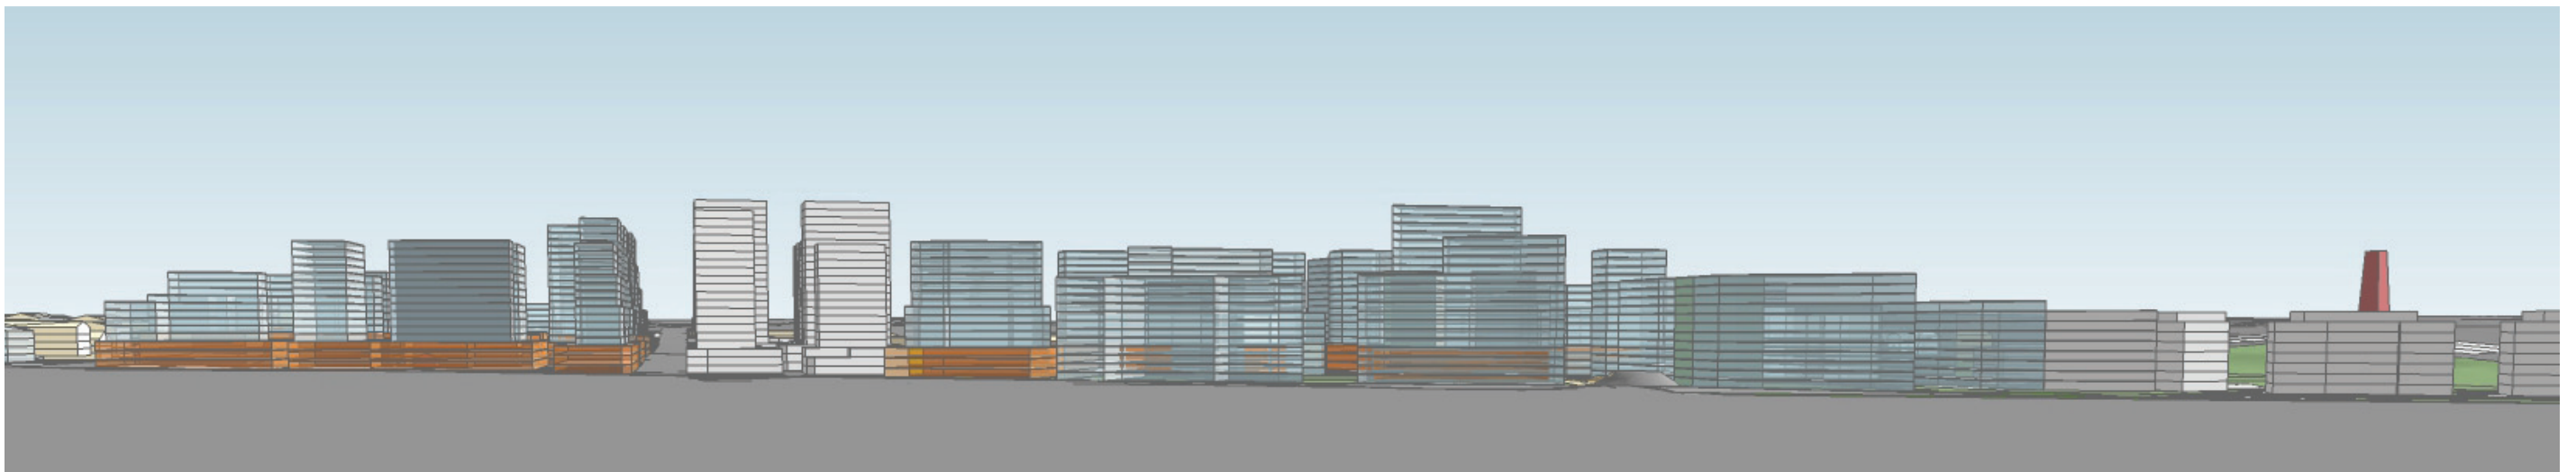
Proposed Built Form Model - Looking West from the Railway Corridor
